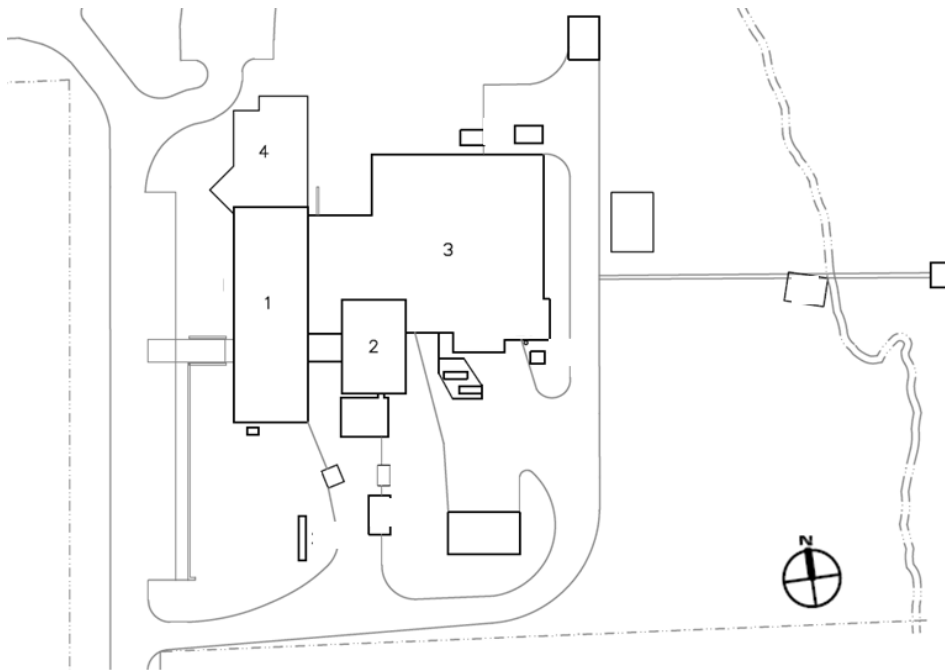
Site plan showing NHEERL Atlantic Ecology Division buildings. (Building #1 – Main office; Building #2 – old wet lab; Building #3 – new wet lab; Building #4 – new office).
